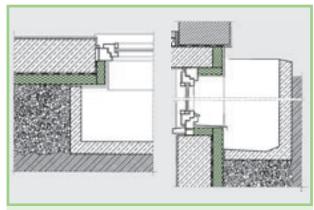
Attachment of a concrete light well, free of cold bridges.
